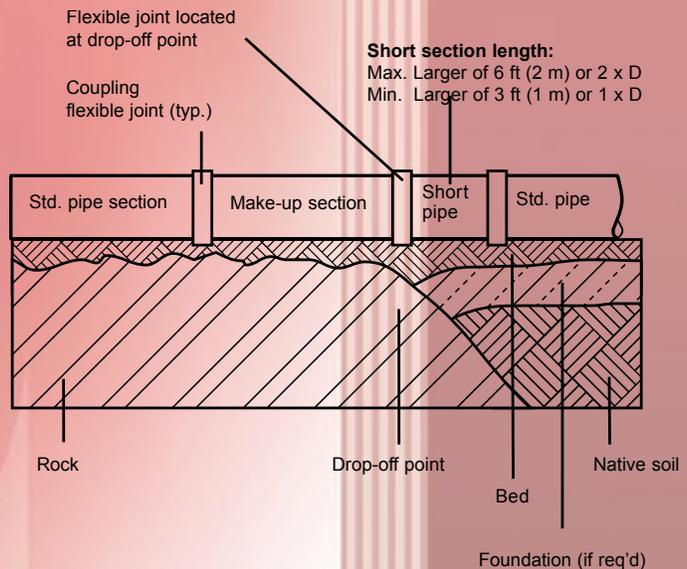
Method of trench construction and pipe layout at rock-soil trench transition or at abrupt changes in bedding conditions.
